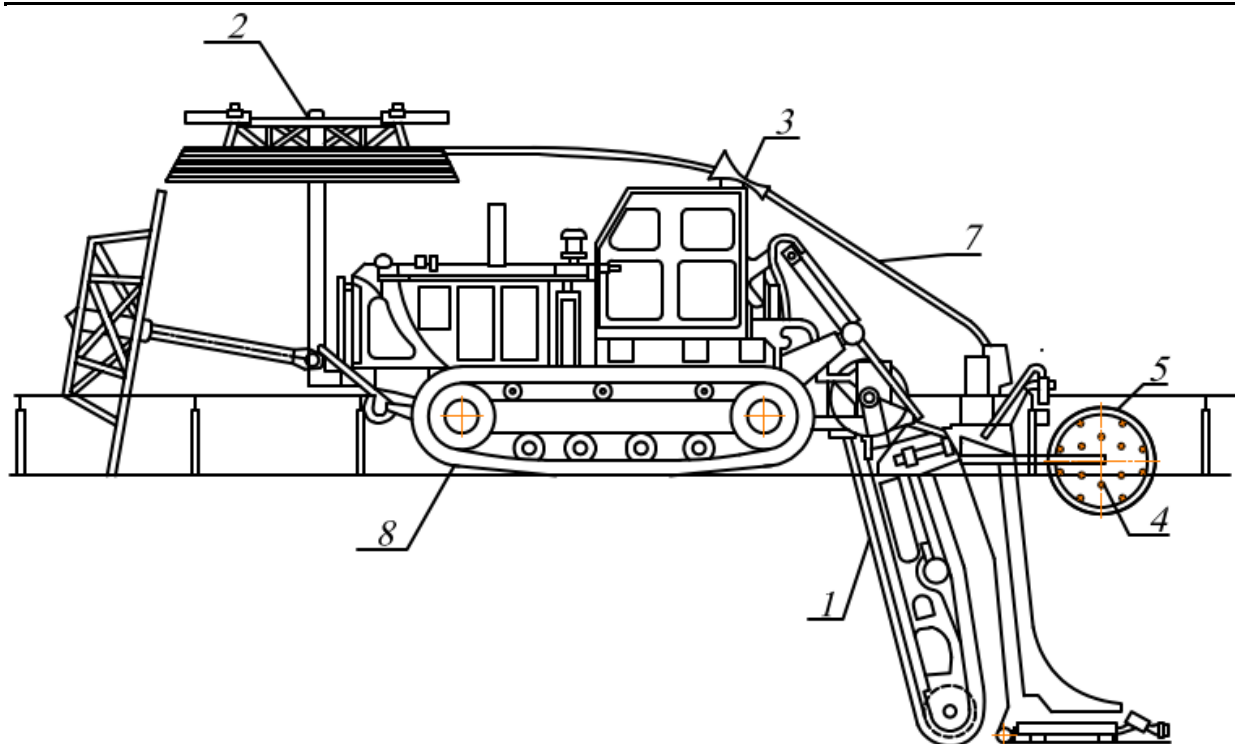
Closed horizontal drain opening machine with improved compactor equipment
